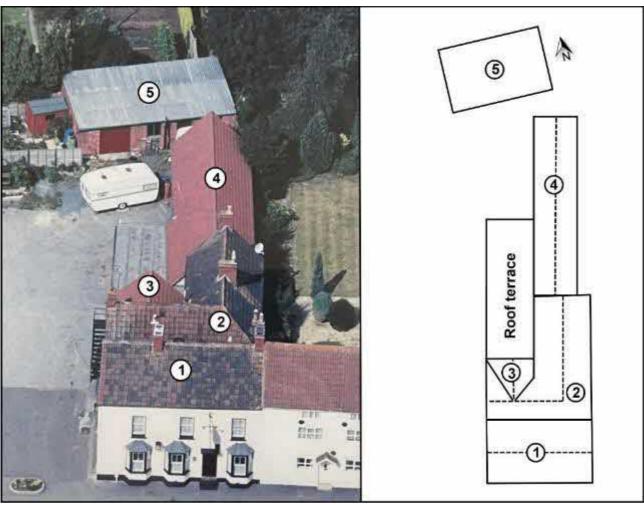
Old aerial photo (circa 1970s) showing the layout of The Boars Head public house (left) and schematic of the buildings surveyed (right); showing 1) original Victorian end-of-terrace; 2) modern L-shaped two-storey extension; 3) modern small two storey extension; 4) modern single-storey extension; and 5) old brick outbuilding (former coach house & stables). A single-storey extension with a flat roof (terrace) is also present.
